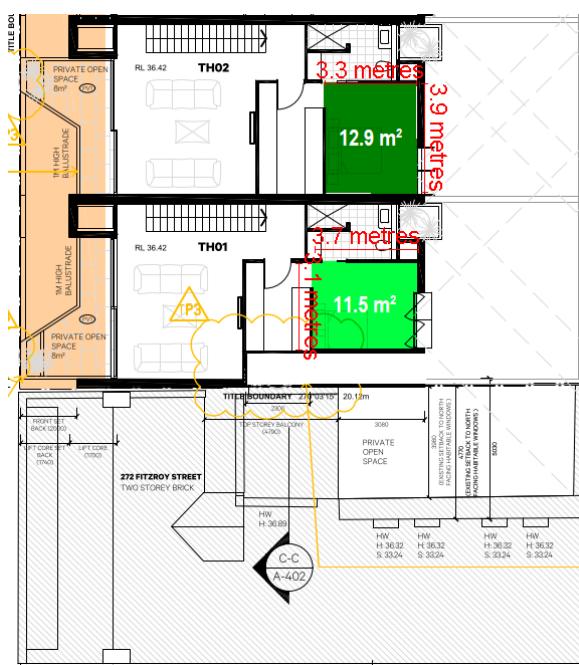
shows the reduced size of the Level 2 bedroom for Townhouse 1 with the required 1.12m setback applied
